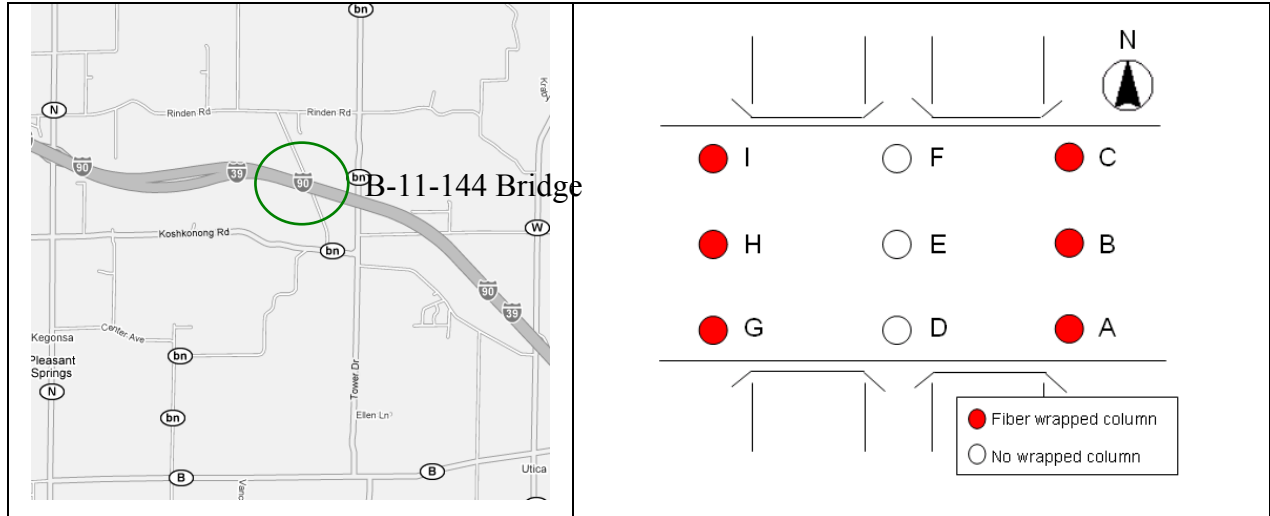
Location of B-11-144 bridge in Dane Co., WI and arrangement of columns (map: after Google Maps 2008).
